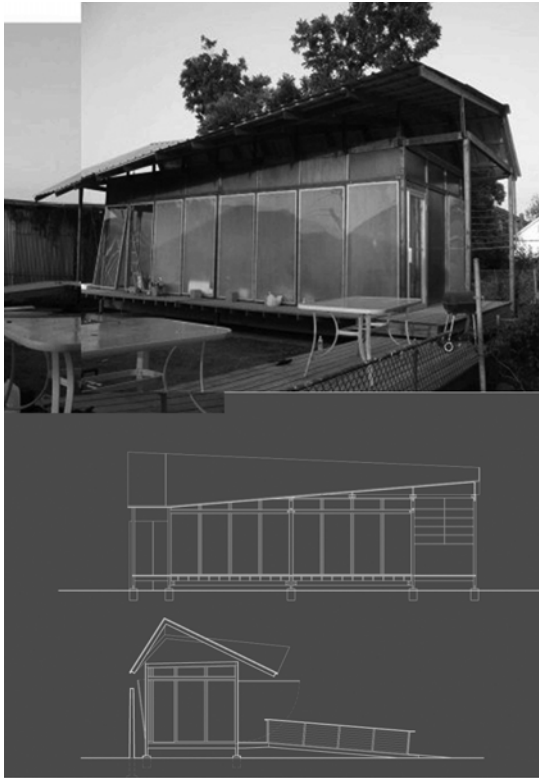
View from Deck (above), elevation (center) and short section (bottom).
